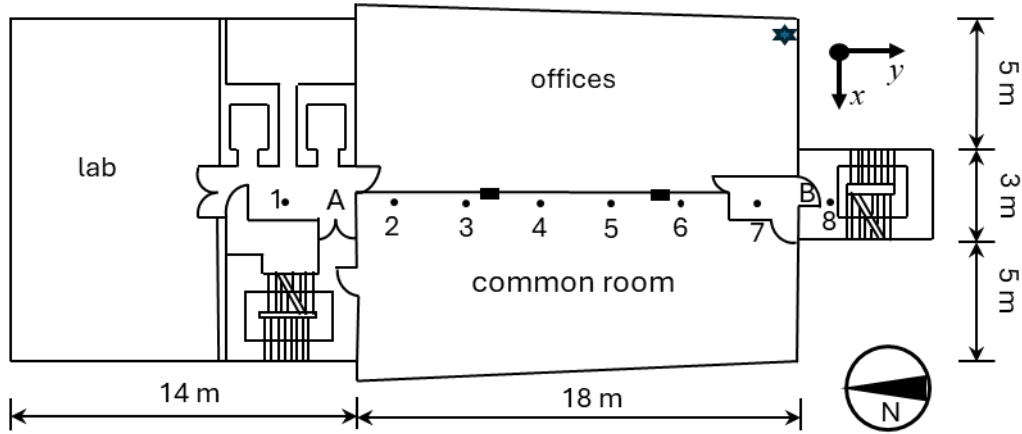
Typical floor plan at Level 10. Dot – test point; black box – column; star – monitoring location.
